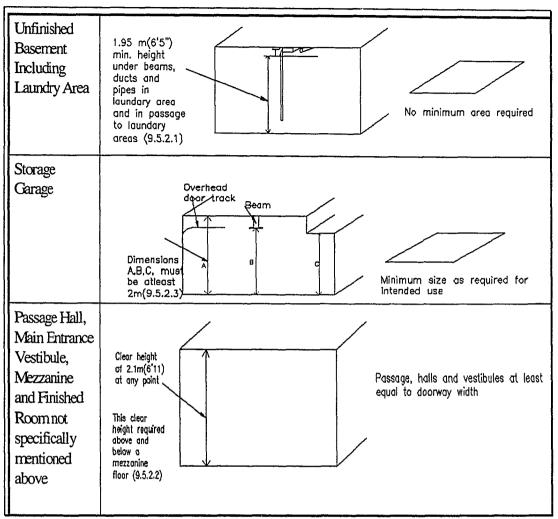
Room Minimum Requirements: Height, Space and Dimensions (3/3)
